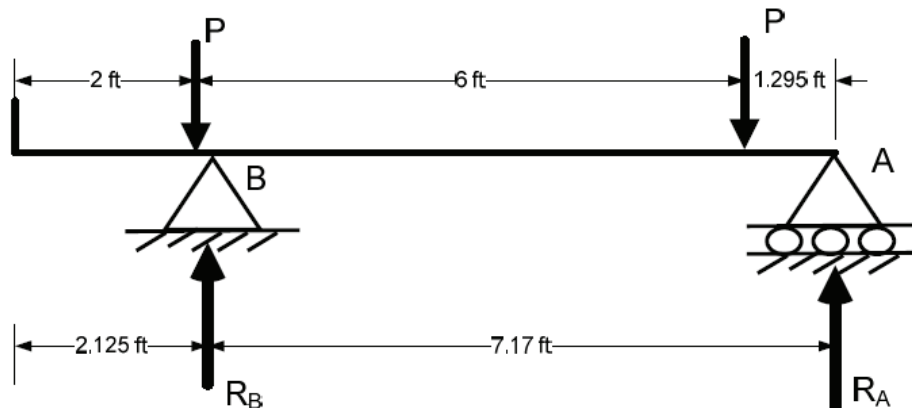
Exterior Girder Moment Distribution Factor
